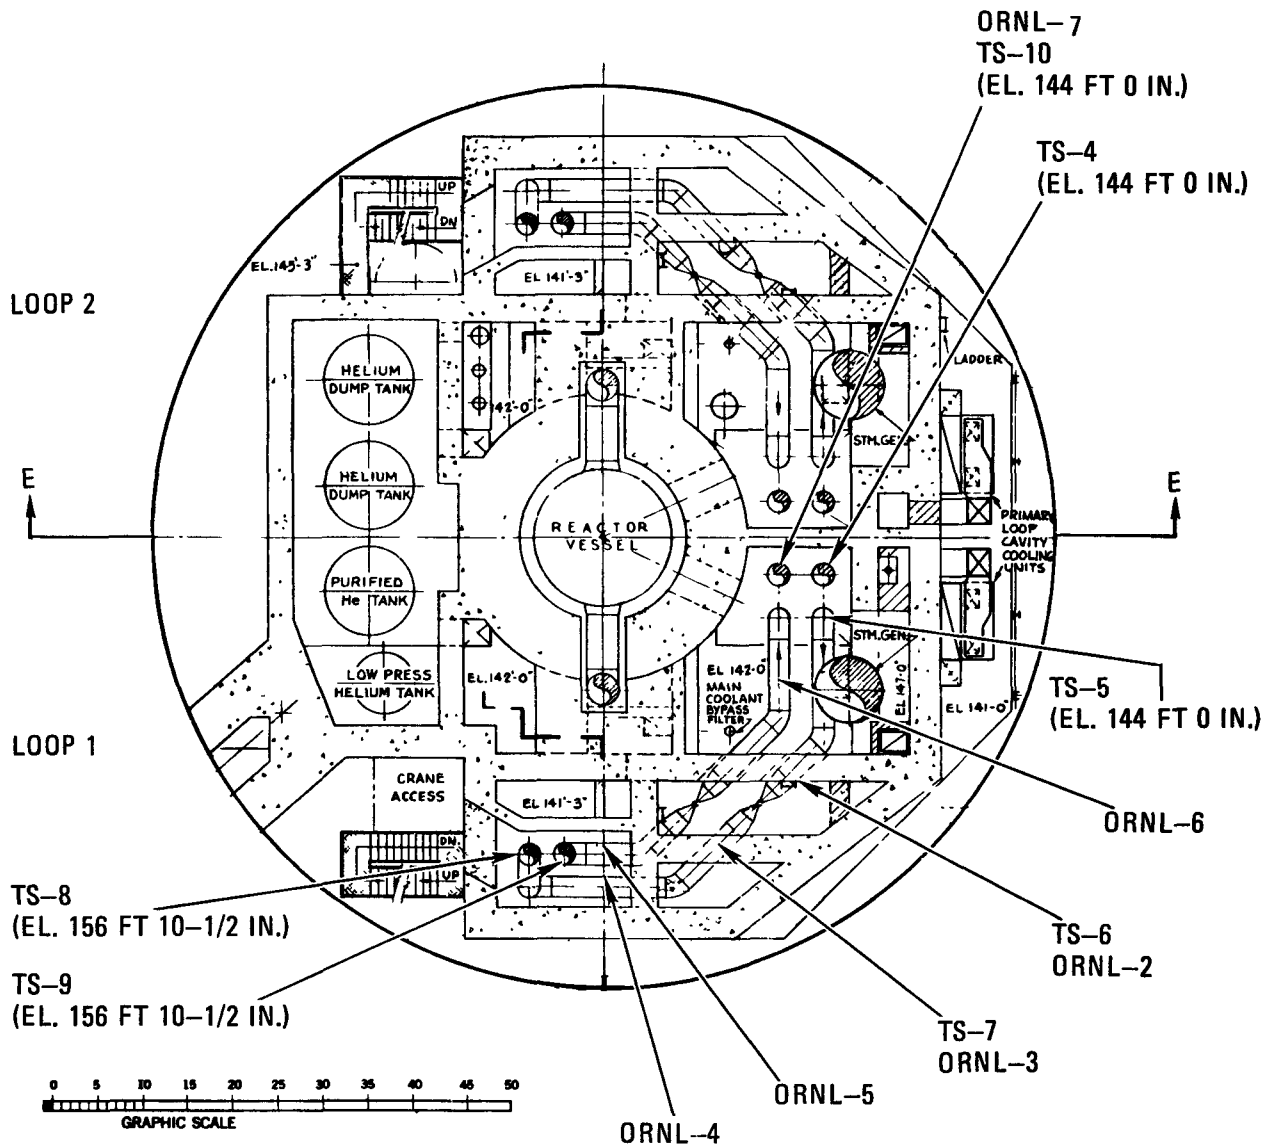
Plan view B-B showing positions 4 through 10 (4, 5, and 10 are at elevation 144 ft 0 in. - 2 in. above floor at 142 ft 0 in.)
